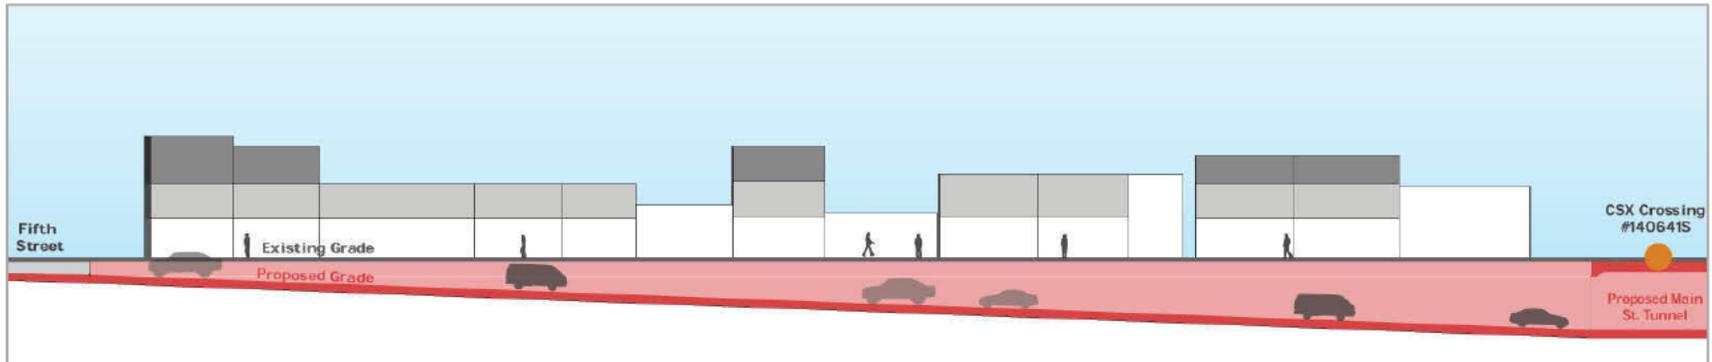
Alternative B Section/Elevation, south facing along 500 block Main Street
